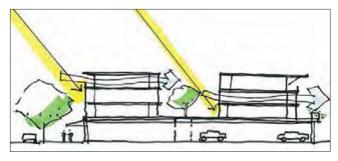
Comfortable separation space allows for sunlight access to individual units and outdoor spaces.
